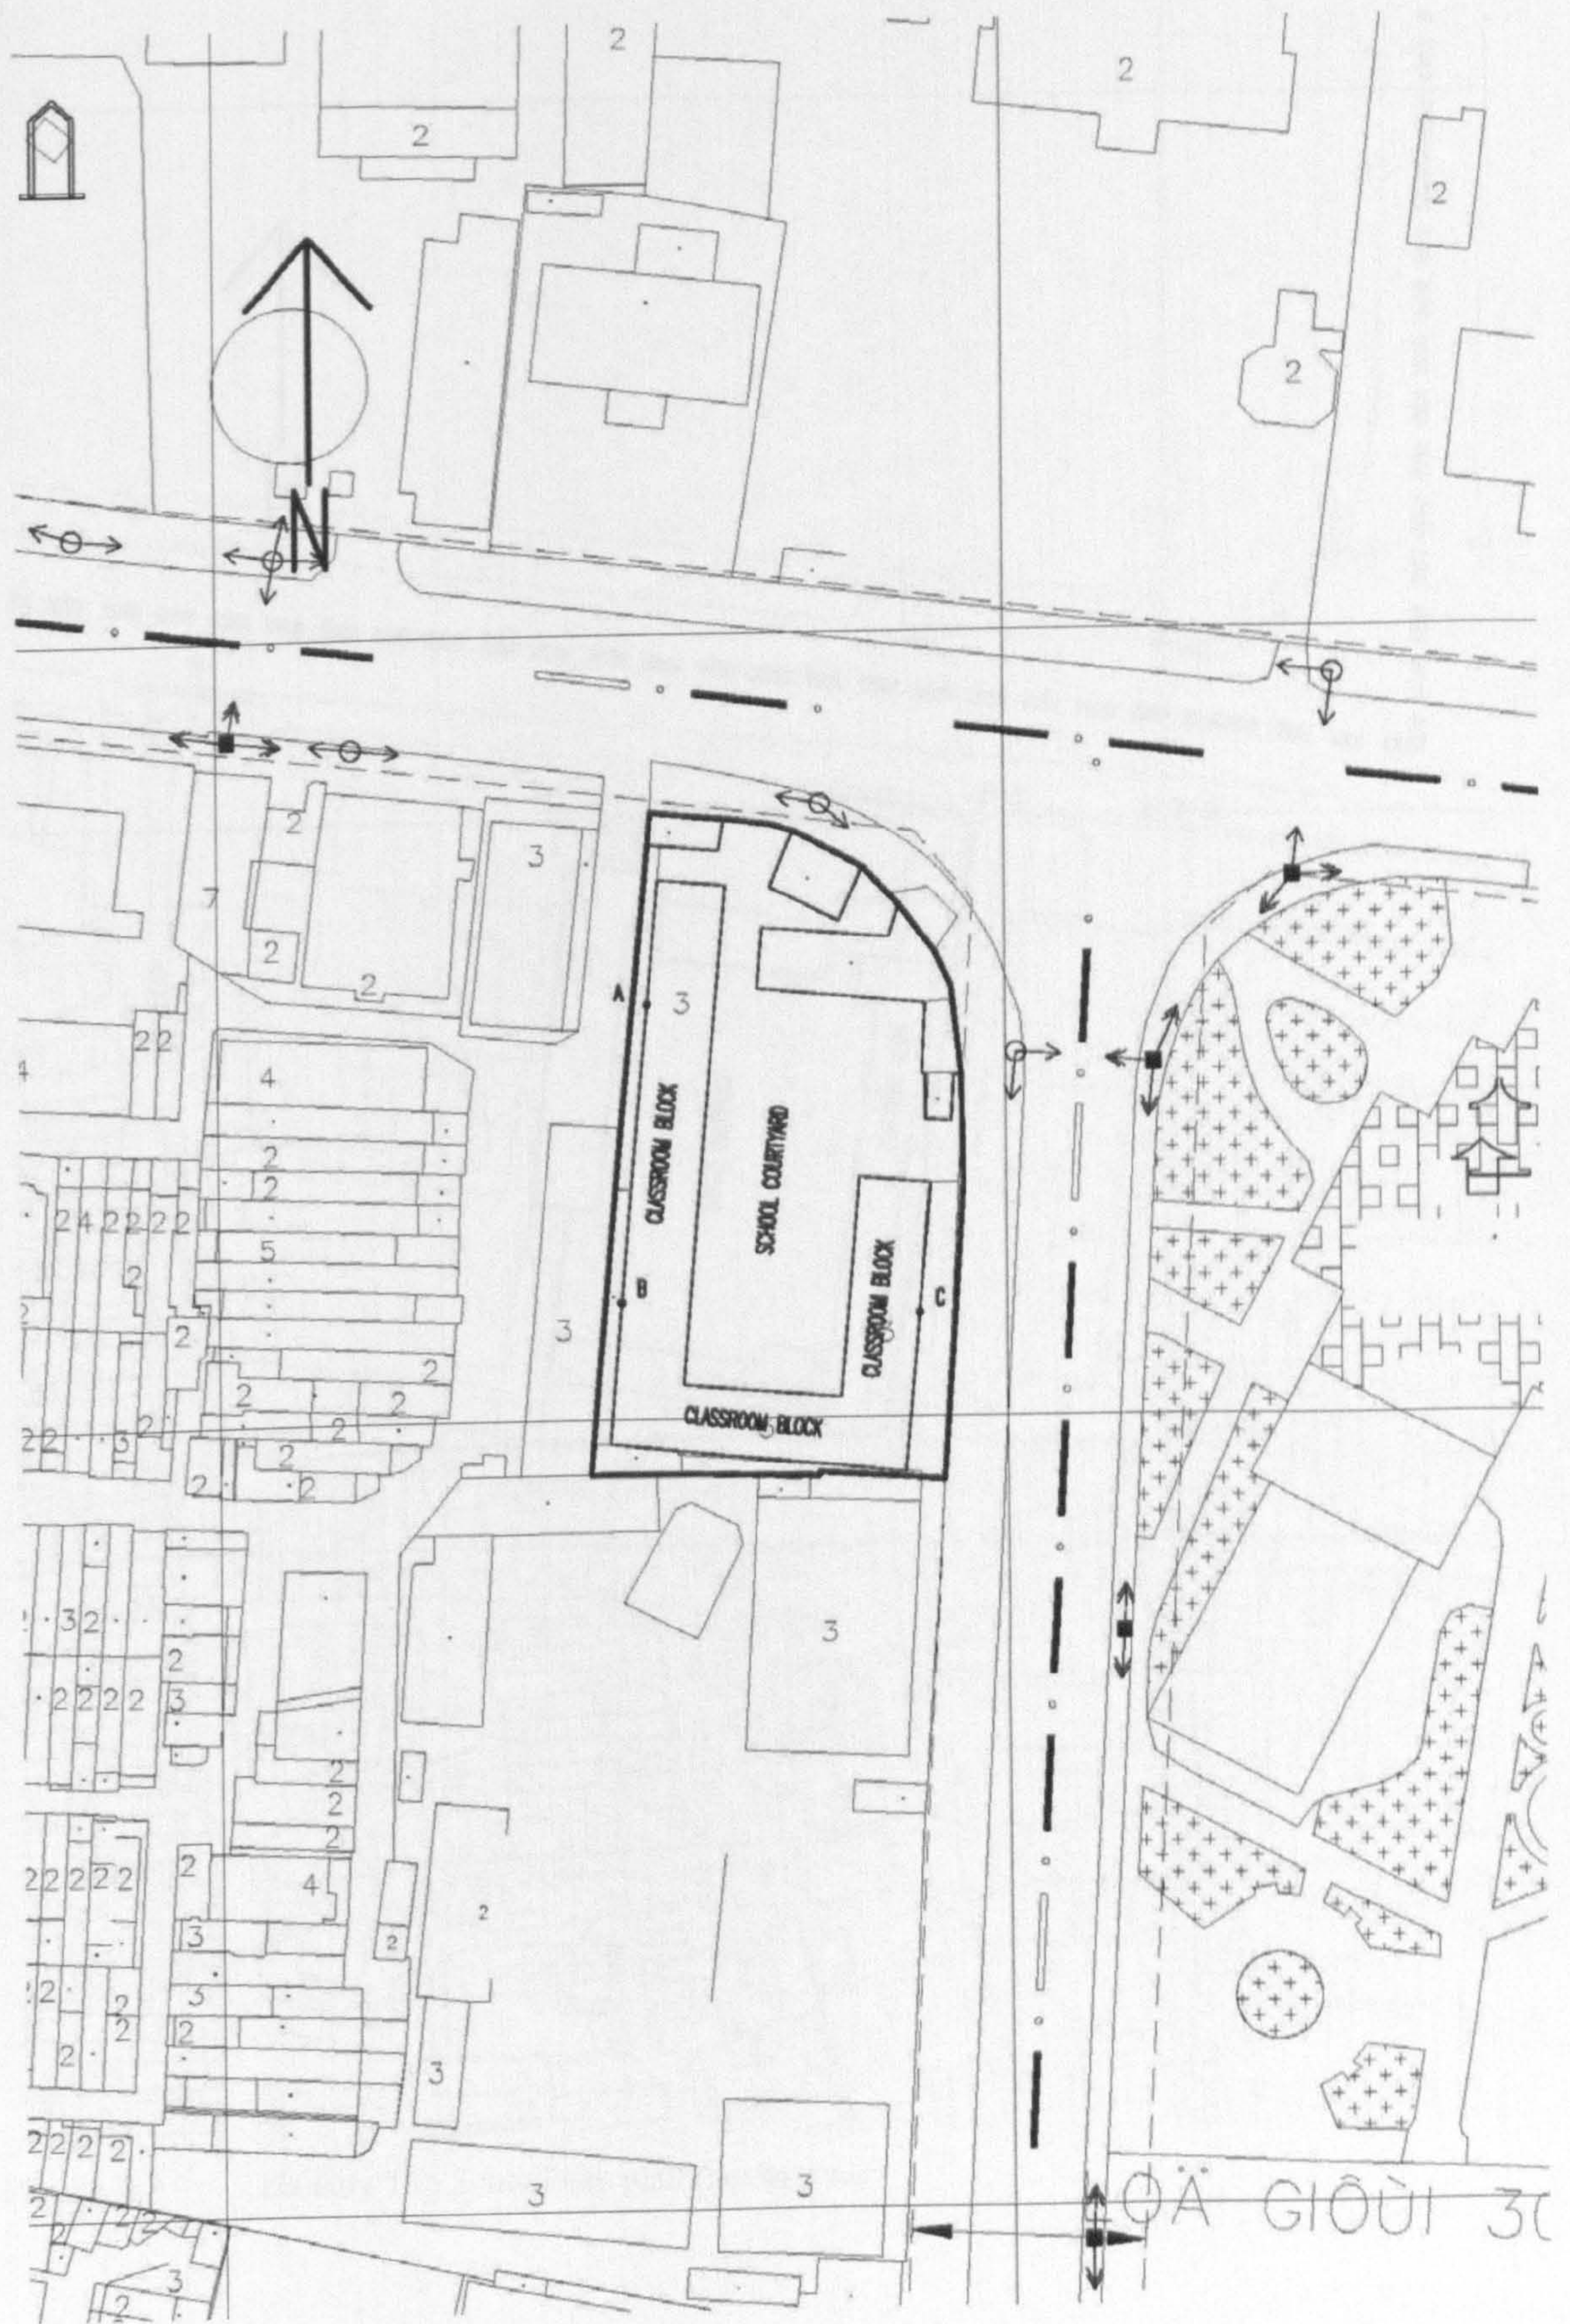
Truong Cong Dinh School site plan (not to scale).
